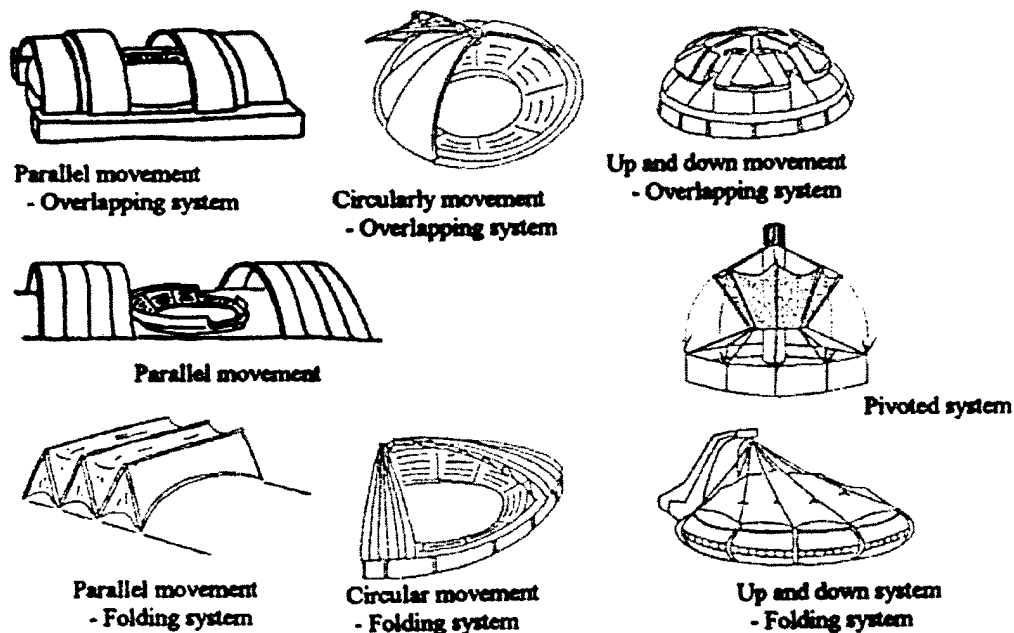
Roofing Systems from Structural Design of Retractable Roof Structures
